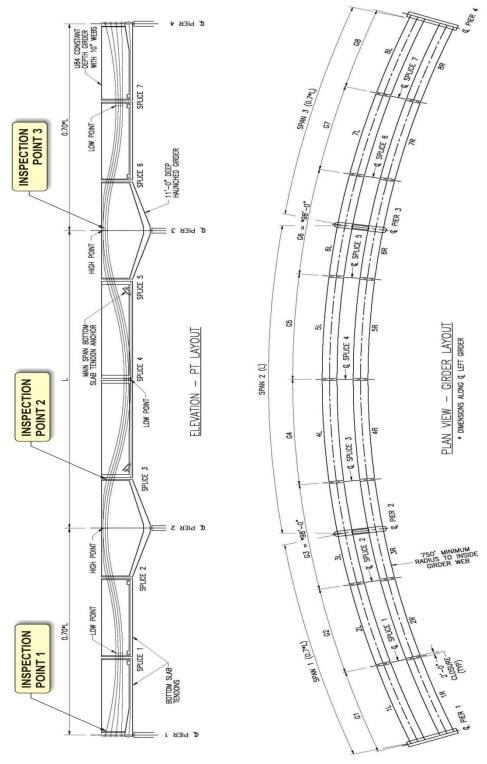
Illustration. Spliced bulb-tee girder bridge inspection point locations.
